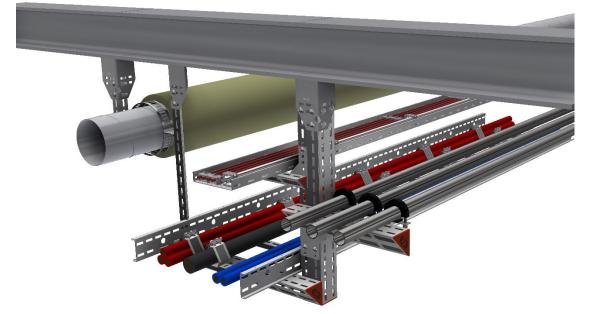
Example of support systems for electrical cables and piping. Photos: Permission to use from Øglænd systems
